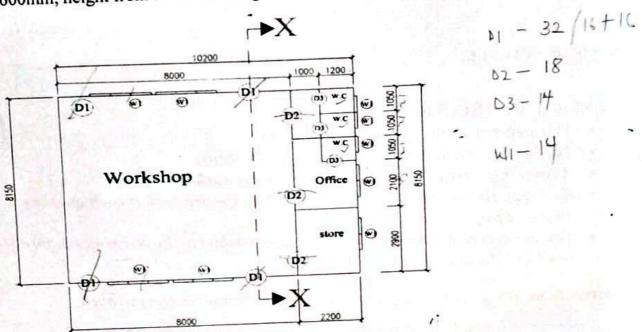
shows outline of a workshop All drawings are measured from outside -to-outside
